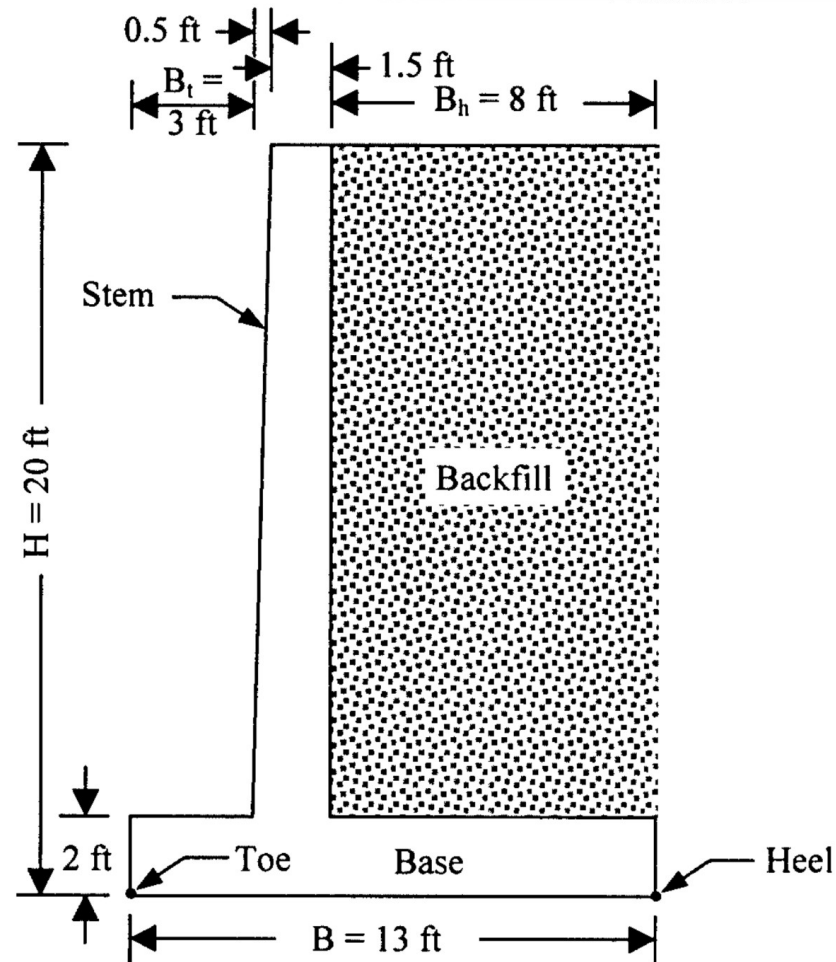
Structural wedge of proposed wall, and backfill and foundation properties
